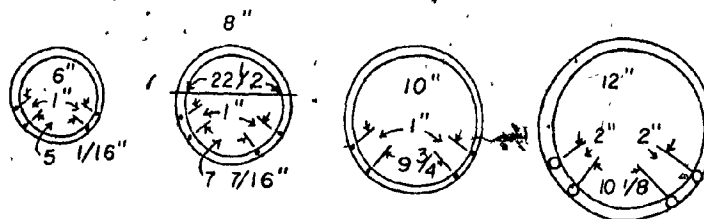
General layout of a perforated pipe cross-section [12].
